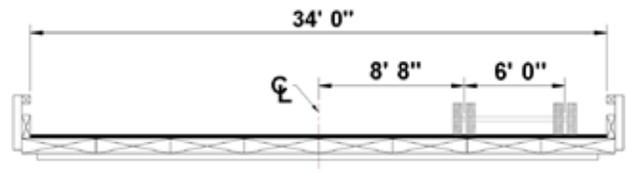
Controlling transverse load position for East Main Street Bridge.
